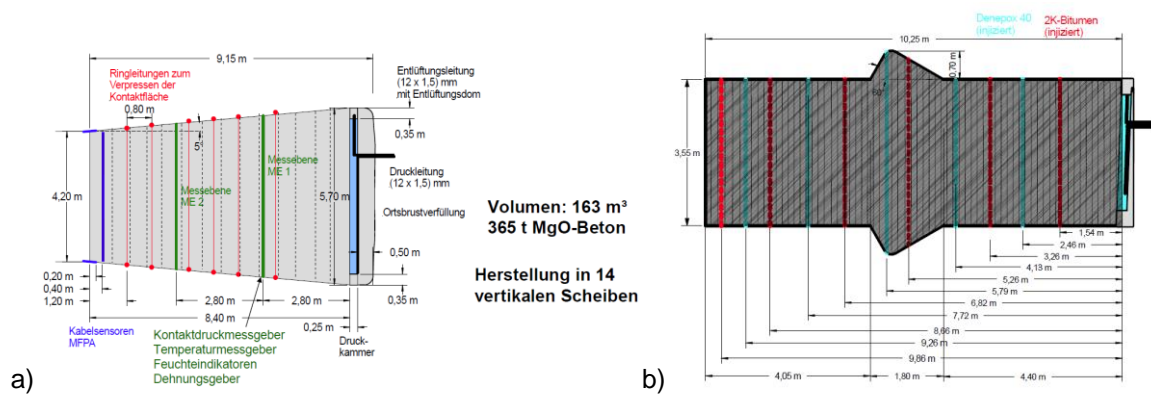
Realized mock-up tests of MgO-based drift seals in R&D-project CARLA at the Teutschenthal mine. a) site concrete dam GV1. b) shotcrete dam GV2 (after GTS, 2010).
